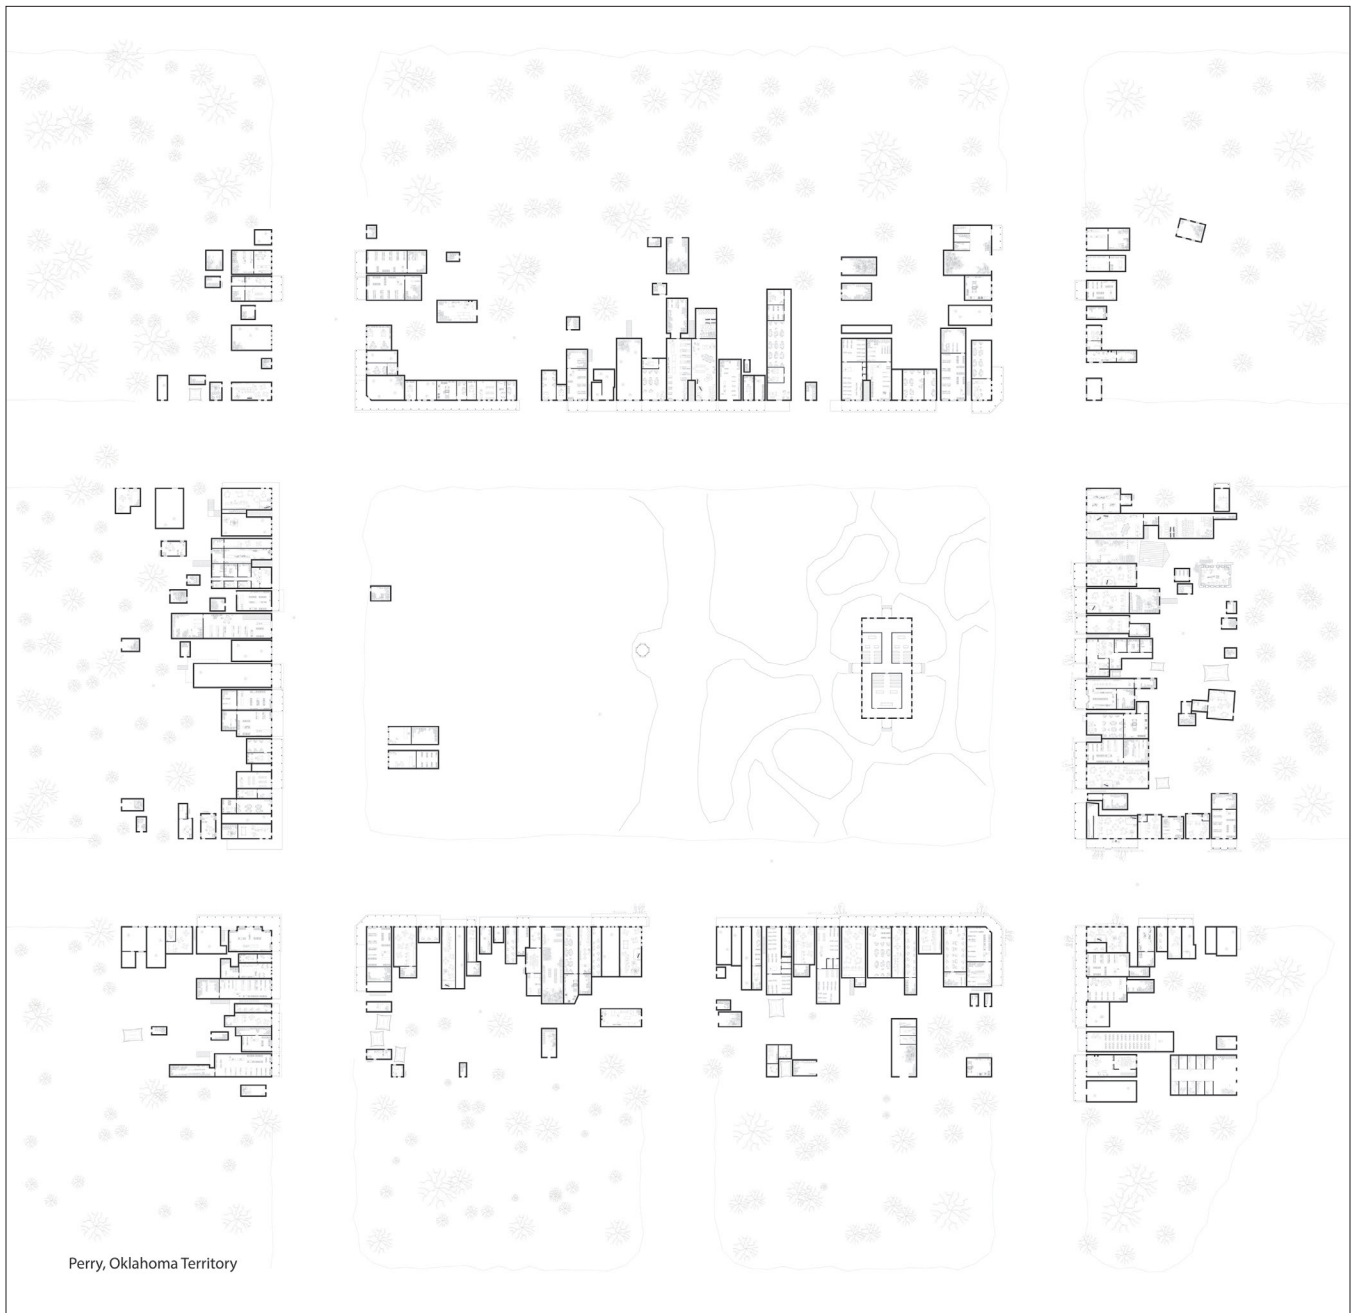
The detailed plan of Perry, Ok, showcasing the typology of the courthouse town. Courthouse towns in Cherokee Outlet were mandated to have at their center a courthouse with main street buildings facing this power structure.
